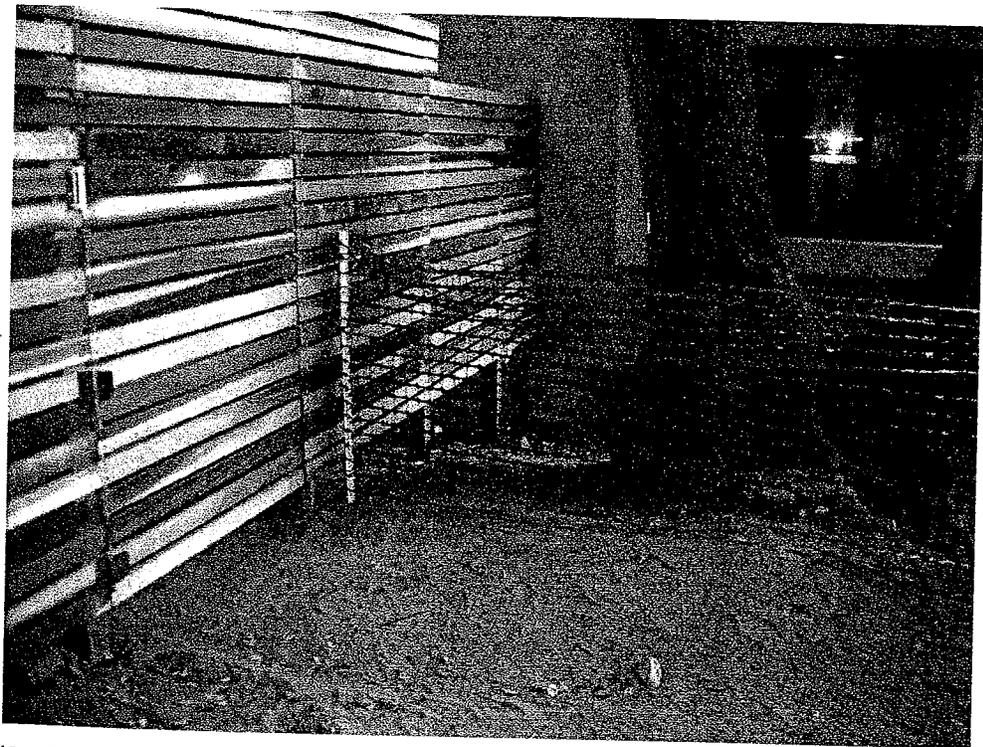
The wood fence was built using wood posts anchored in concrete. These types of post holes require little excavation and preserve the root mass from being severed.
